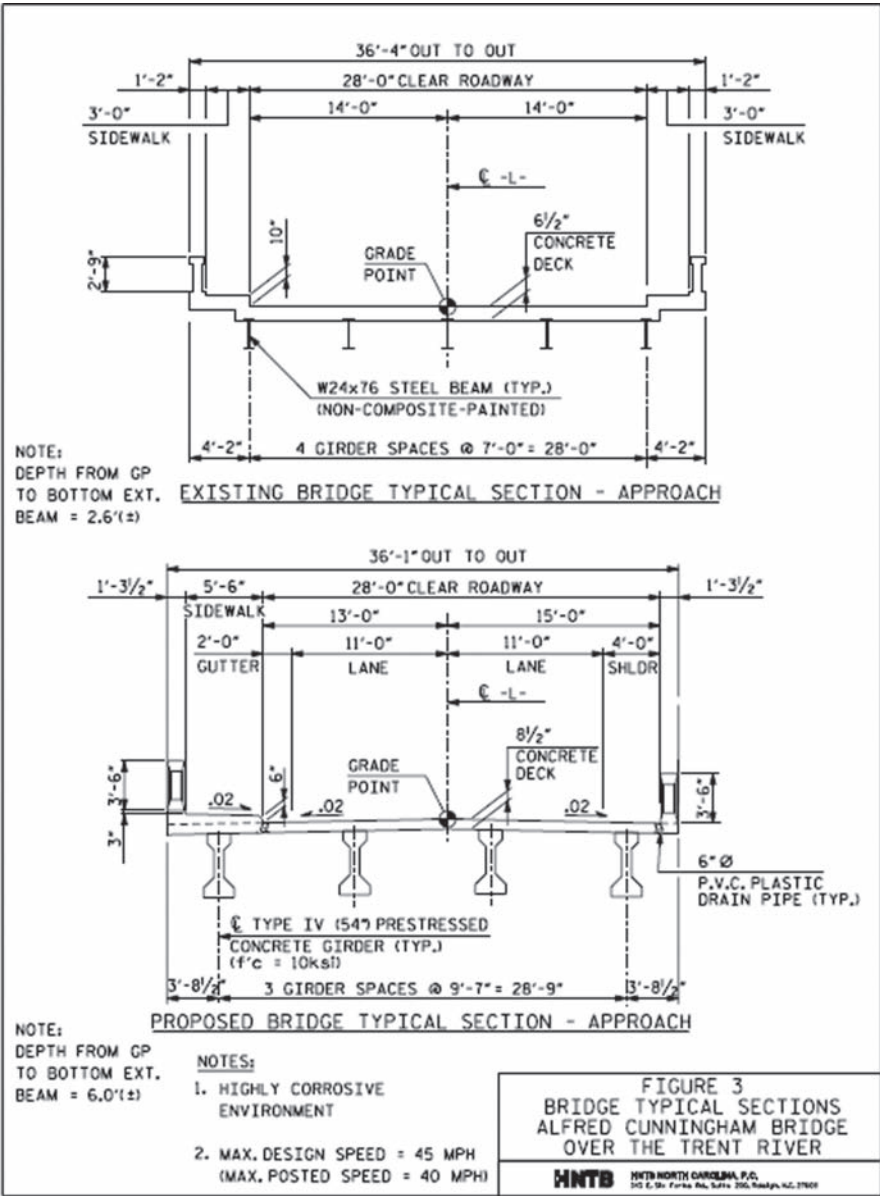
Existing and proposed bridge cross sections (Categorical Exclusion, 2006).
